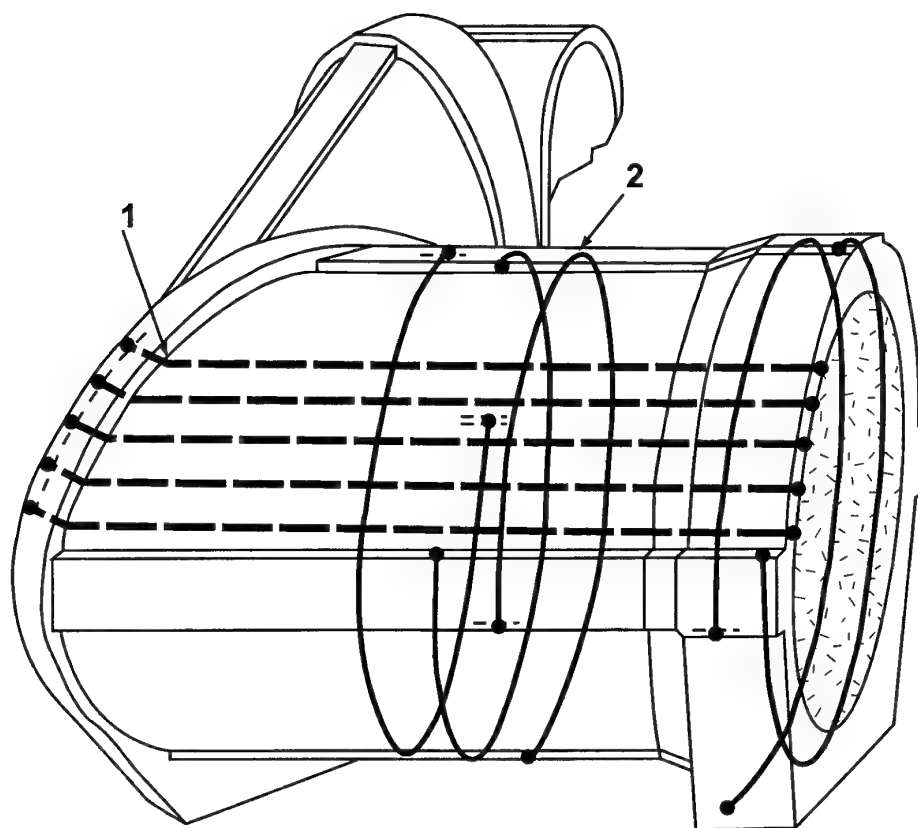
Pre - stressing cables in the ONERA F1 tunnel
